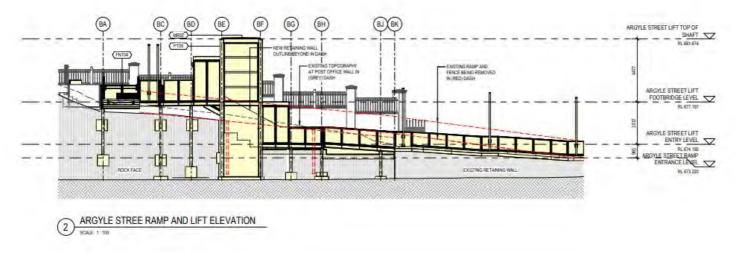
Argyle Street ramp section and elevation showing demolished ramp (red) (Architectus, drawings dated 19/1/2024)
